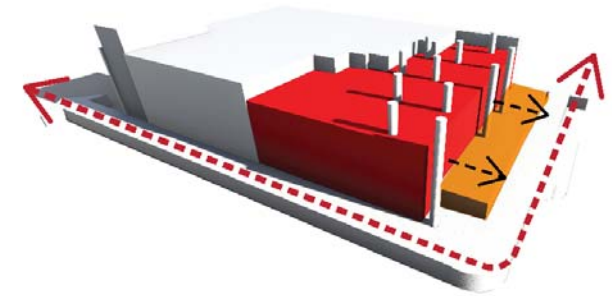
17 : Ground Floor 3D Diagram, WAM
